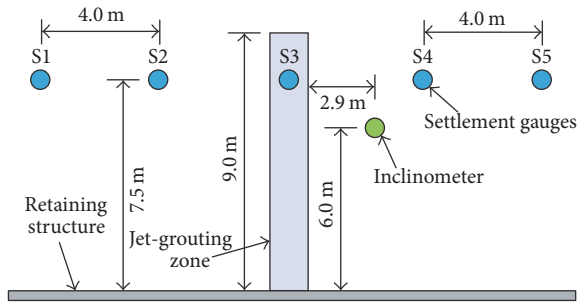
Plan view of the layout of ground settlement gauges and inclinometer (group column installation case).
